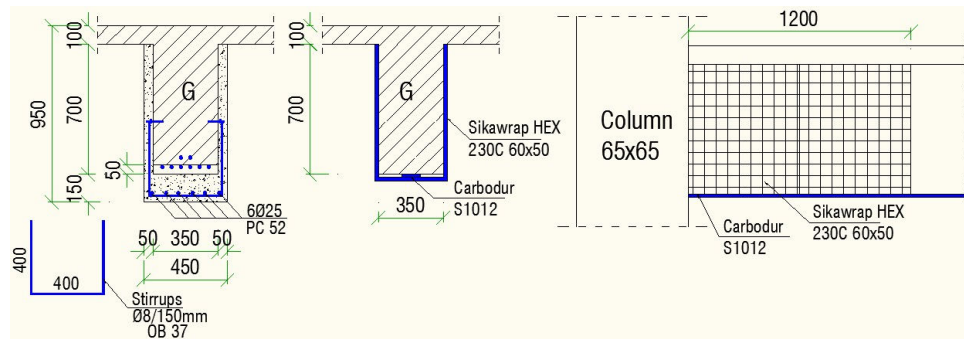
Strengthening of the girder by RC Jacketing and CFRP composites
